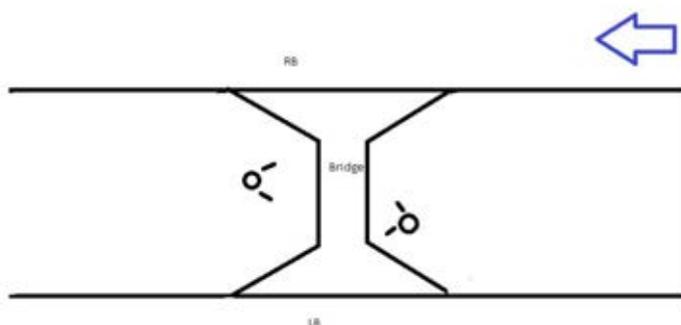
Site plan for Ten Acre Woods Barrier 1
